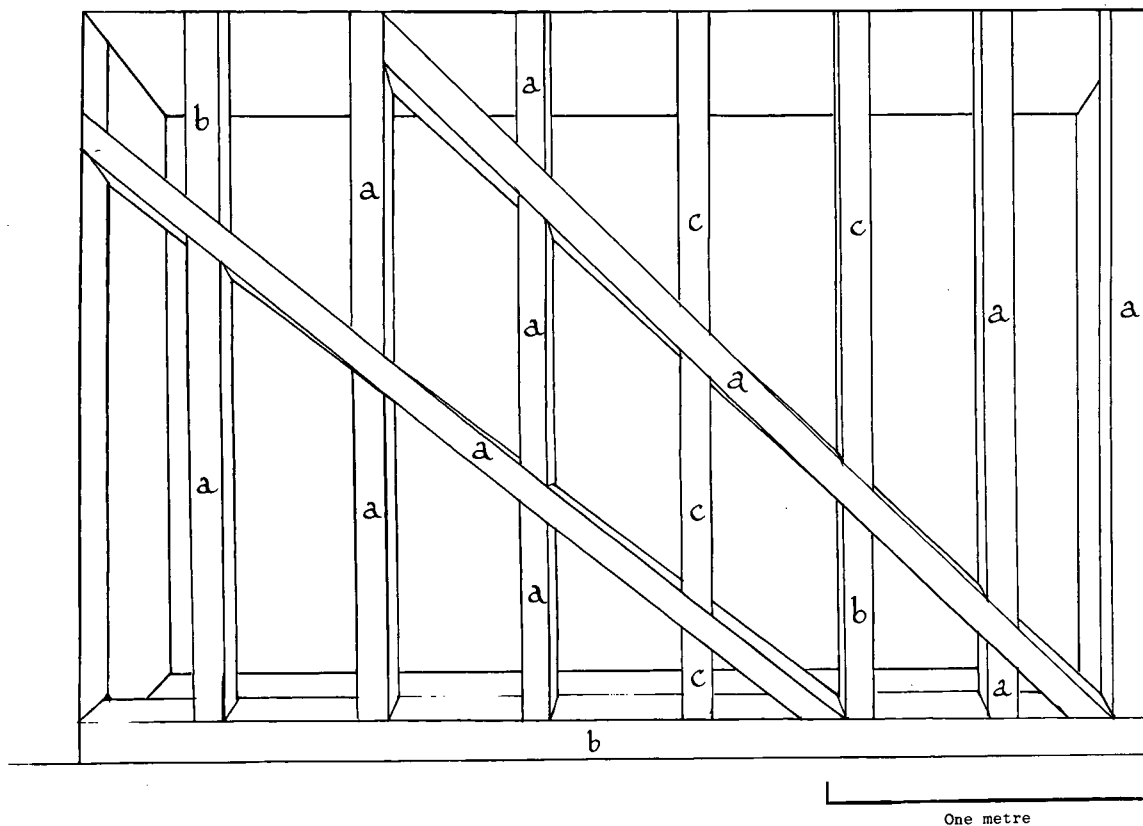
Internal wall (now removed) at No. 80 Church Street, Lavenham: wall frame with laths and plaster removed, showing *a* — timbers bearing complete rows of tenter-hooks; *b* — timbers with no tenter-hooks; *c* — missing timbers.
